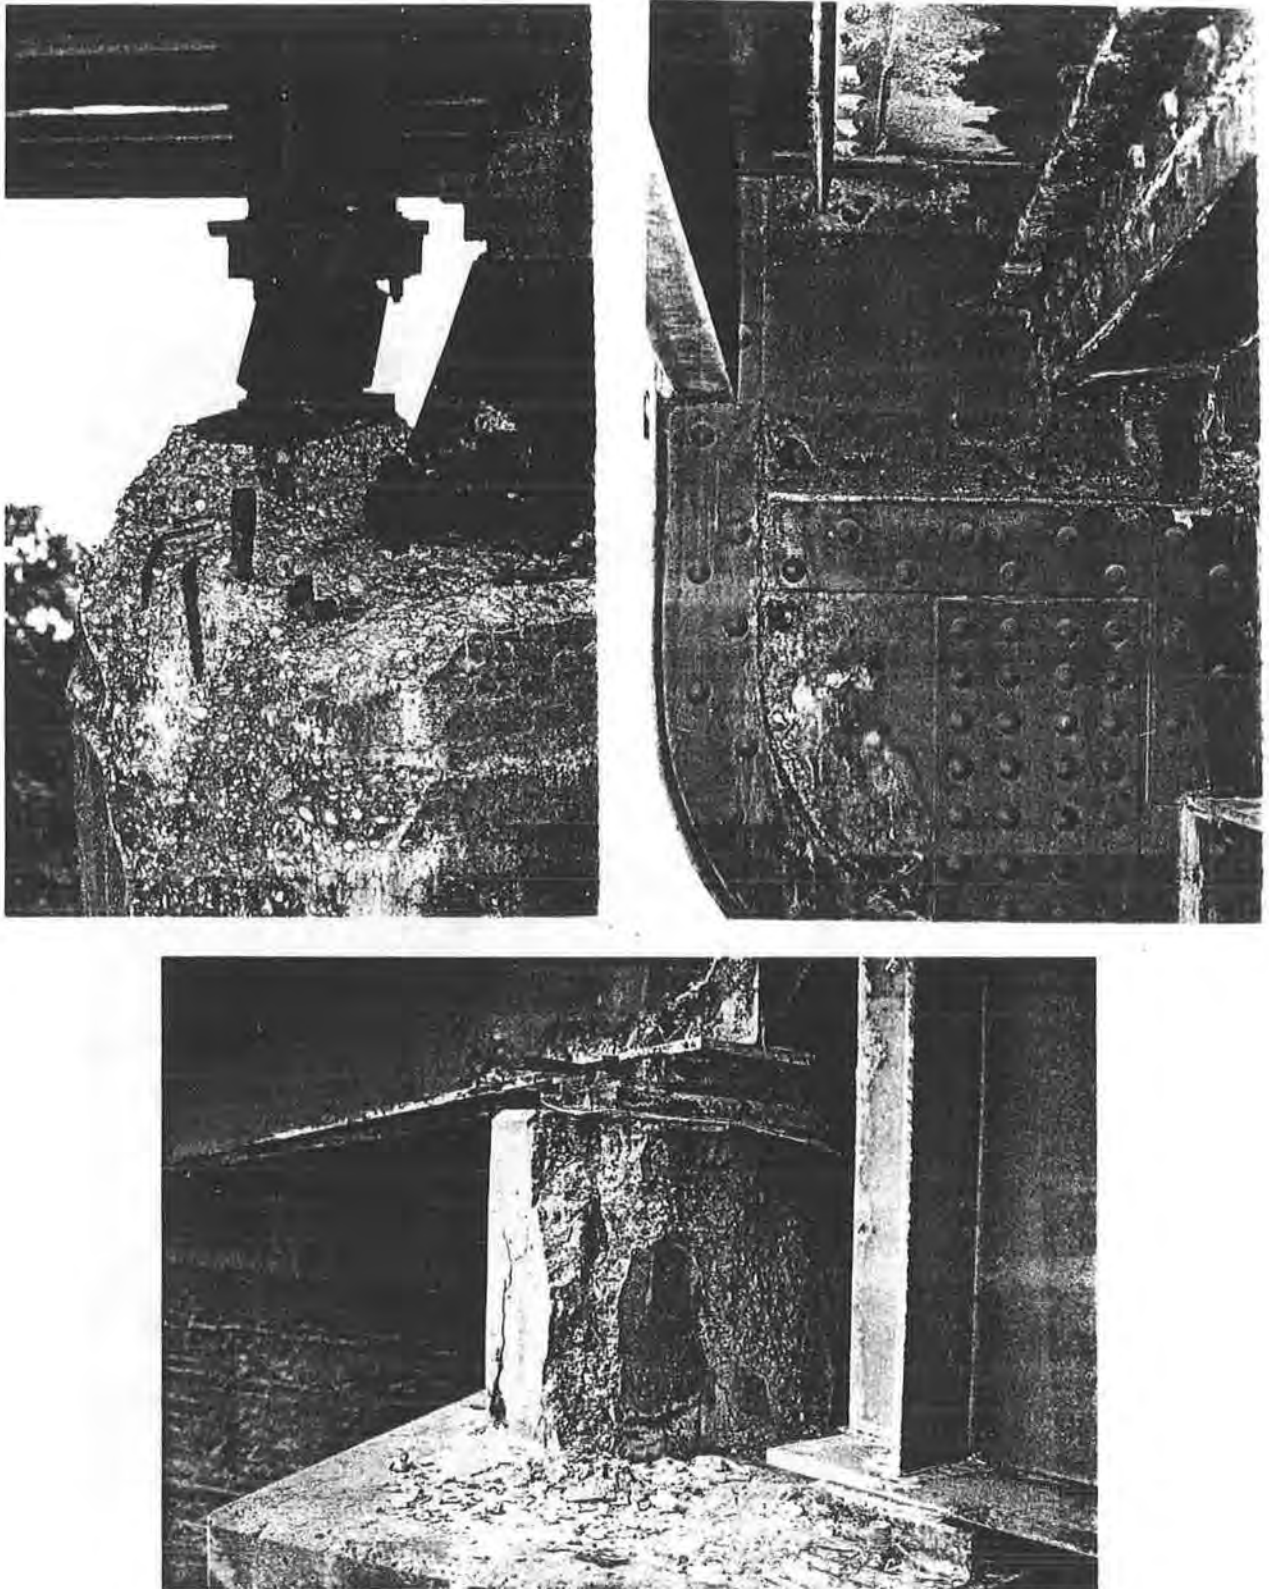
Massive Concrete and Steel Deteriorations Due to Water Leakage Through Joints [17].
